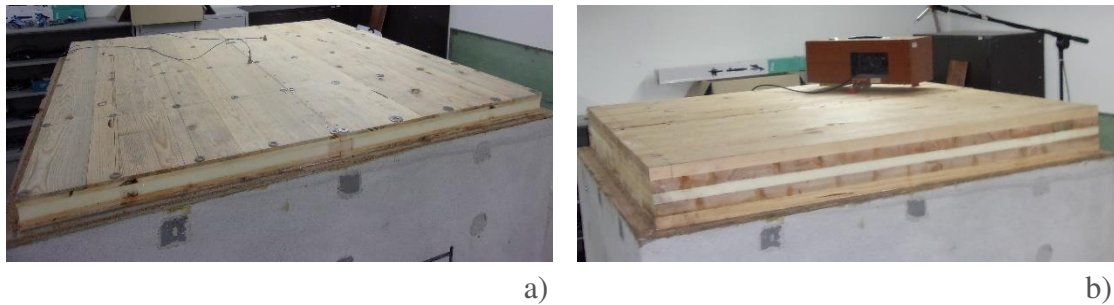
Simplified impact sound insulation test of: a) CIT 70 floor; b) CIT 170 floor.
